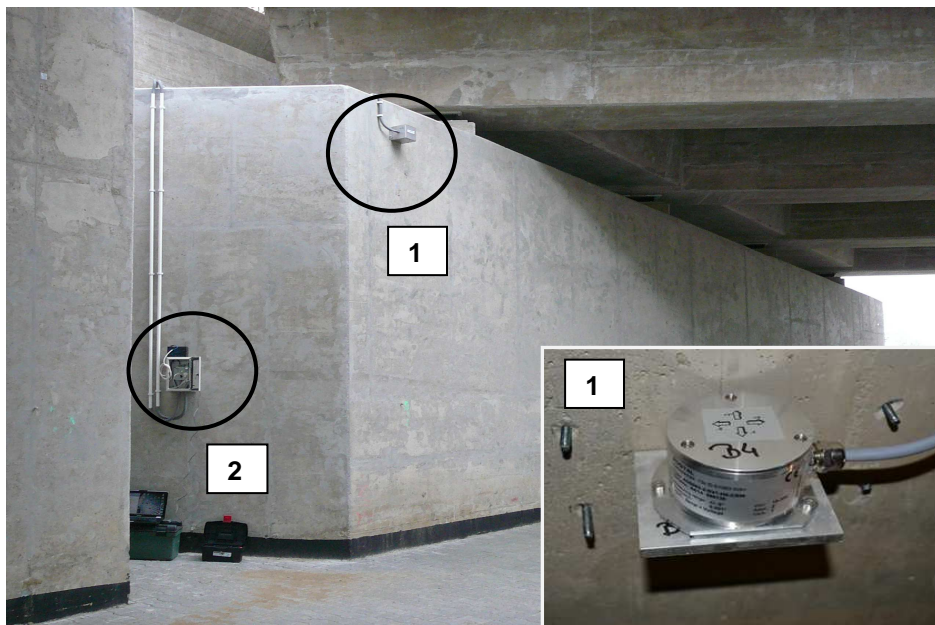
View the inclinometer system installed on the wall abutment; 1 – inclinometer sensor, 2 – measuring box
